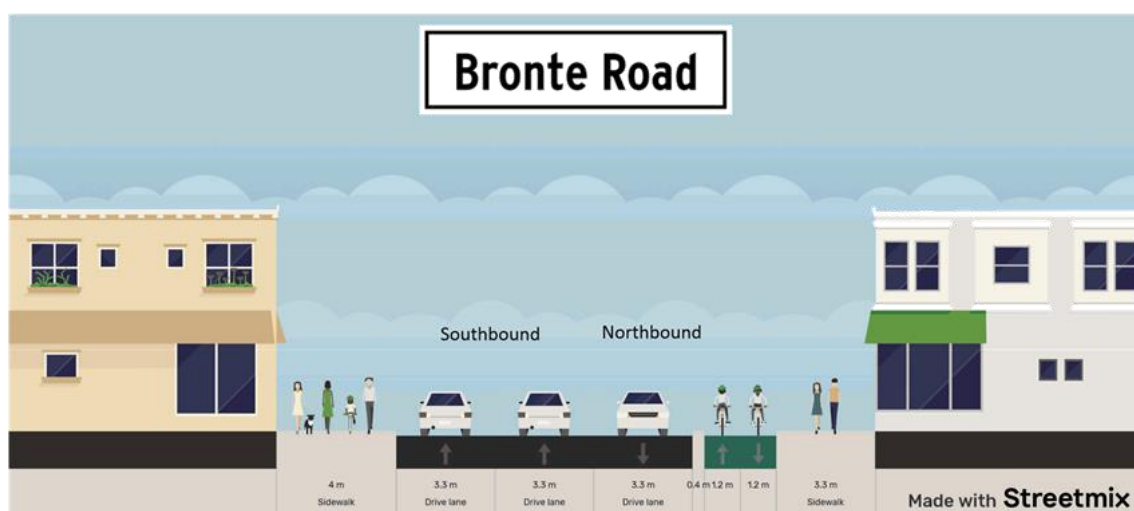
Cross Section of Proposed Bronte Road (16 Bronte Road)
